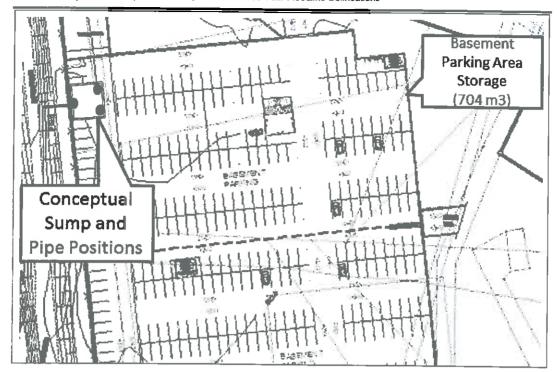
Conceptual Plan View of the Basement Level SWMP Infrastructure
